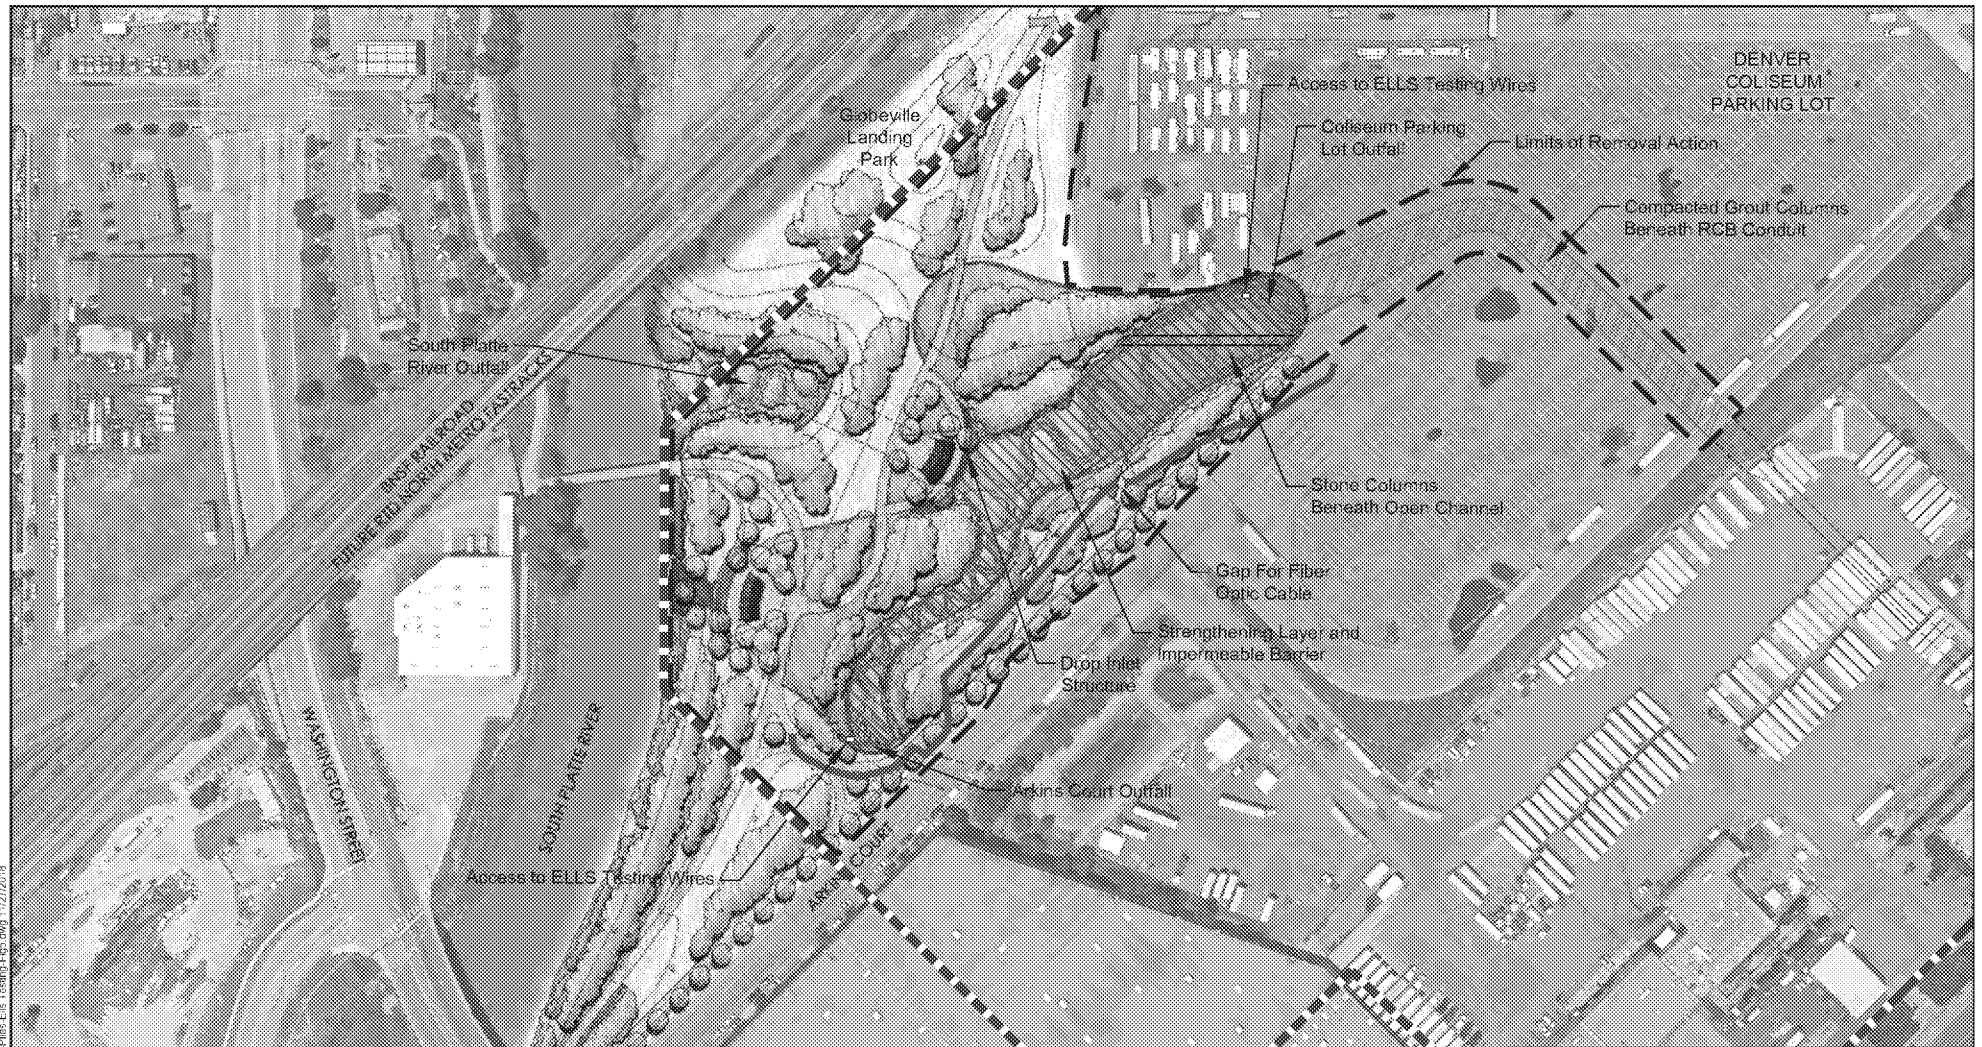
Sheet Piling Alignment and Access to ELLS Testing Wires
